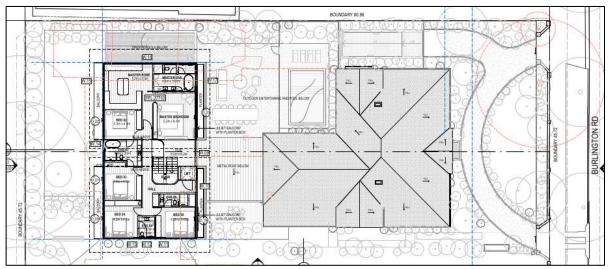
Proposed first floor plan. Red dotted lines shows proposed demolition of original structures and tree removal.
